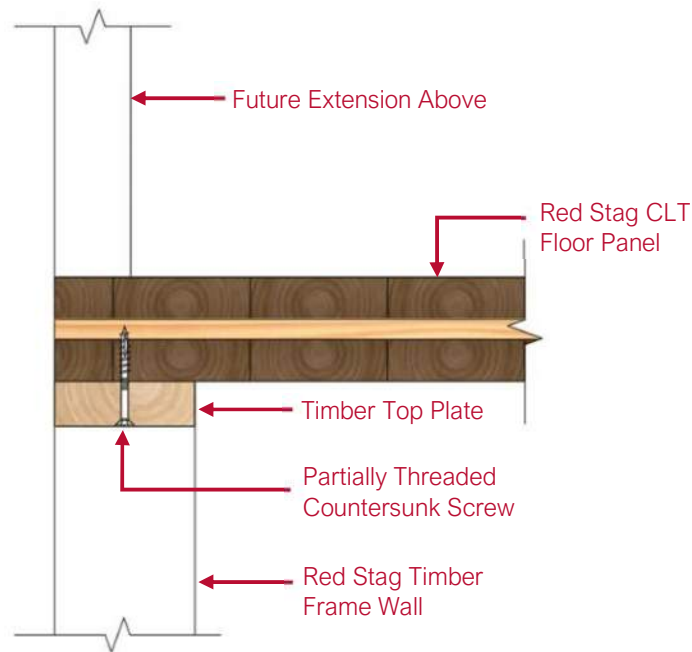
Timber frame wall to Red Stag CLT floor panel connection.
